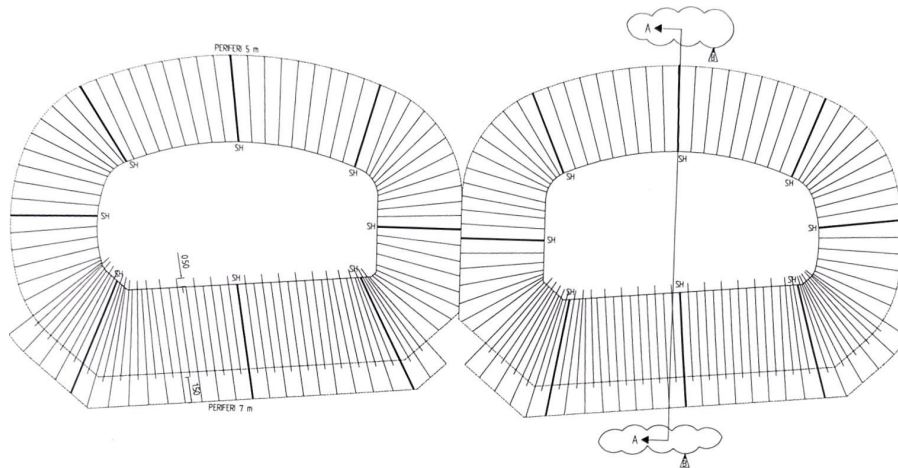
The grouting design used for the main tunnel tubes for the Göta tunnel (Technical drawing 200B2442).
